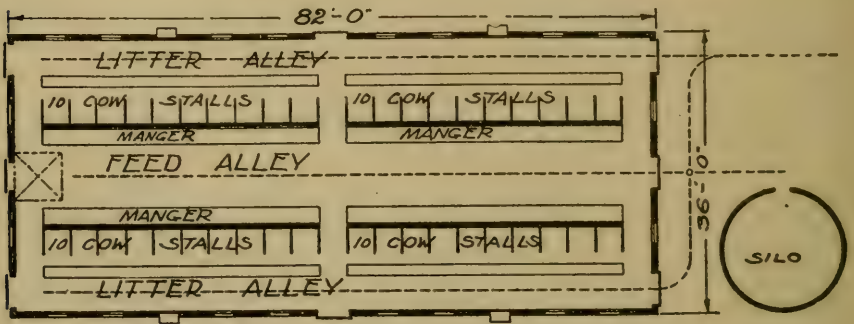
Floor plan of a good barn in which the cows face the center. The calf pens and milk room are not shown.
